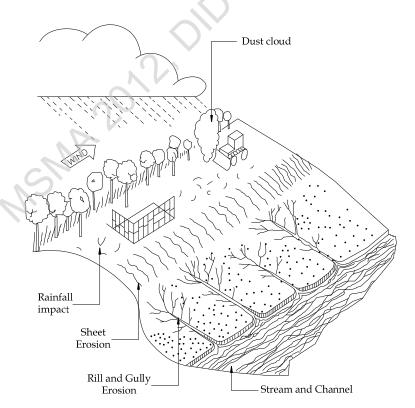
Types of Erosion Occurring at a Construction Site (CDM, 1993)
